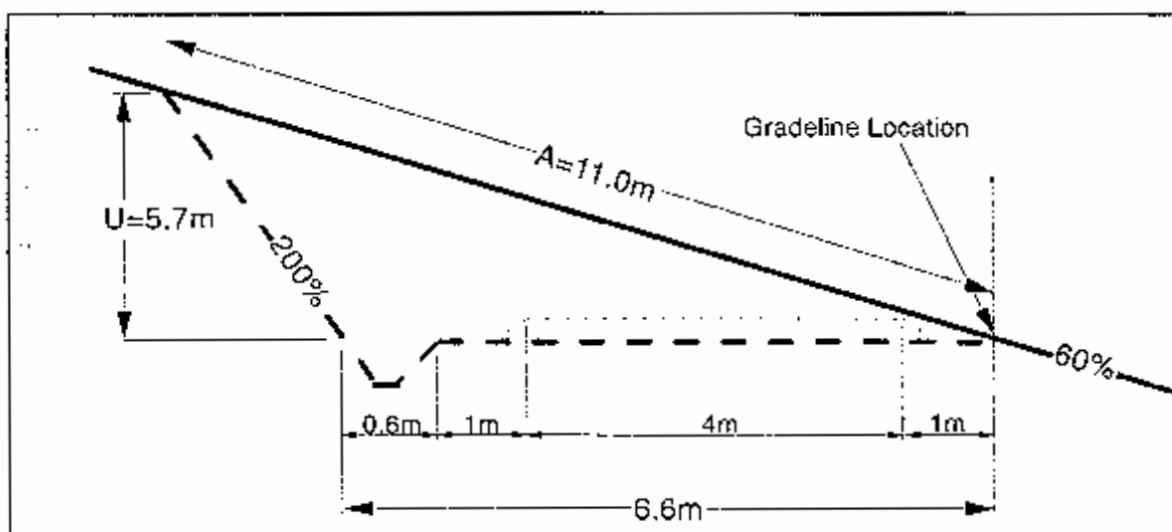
Setout information for road cross-section with a side slope of 60%.
